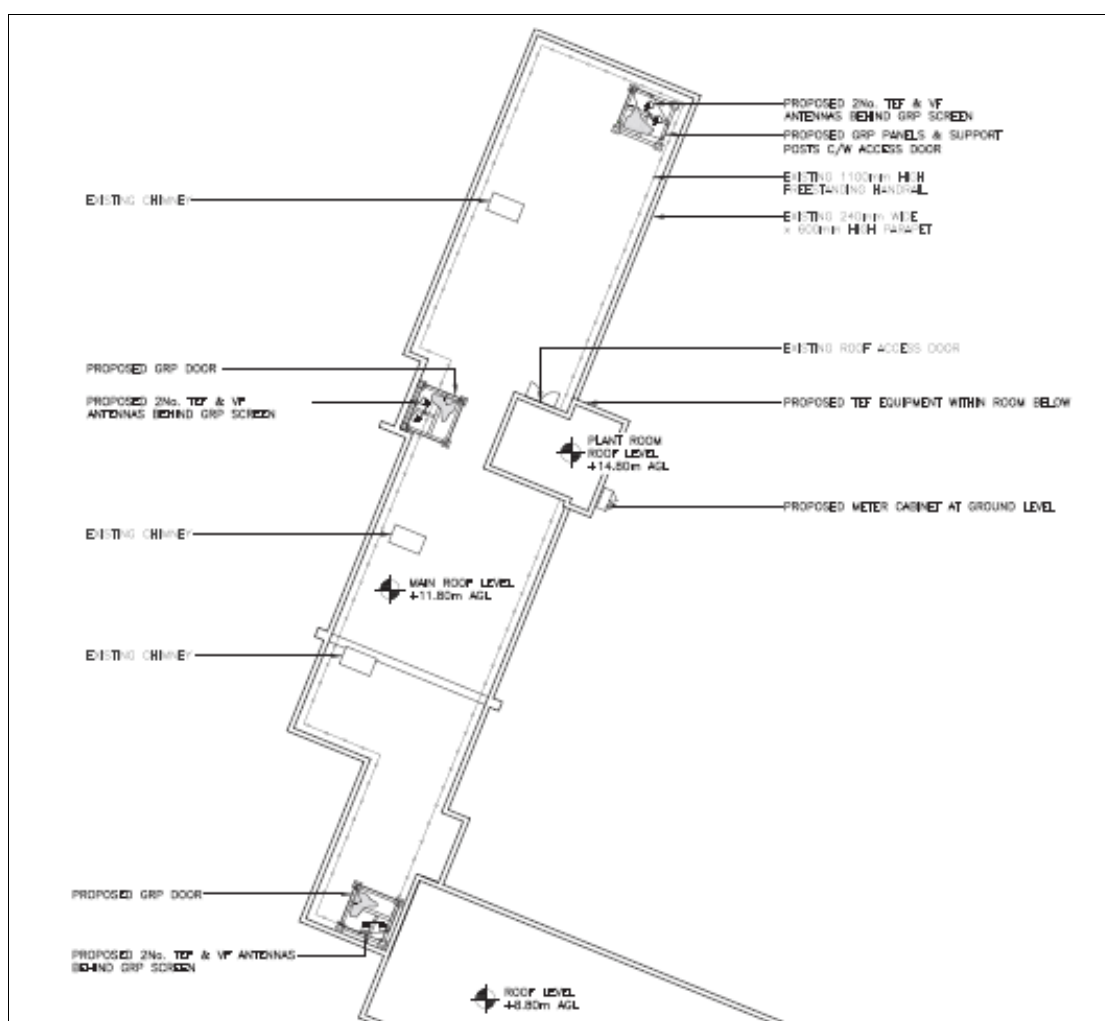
Alternative design for rooftop installation with bespoke, colour-coded GRP cladding designed to replicate existing plantroom
